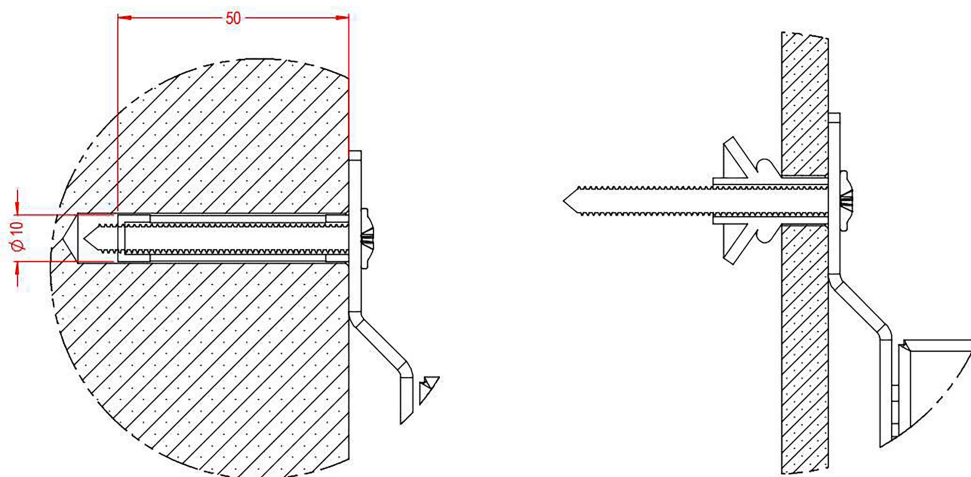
Details of the fastening of the panels to concrete and hollow brick walls
